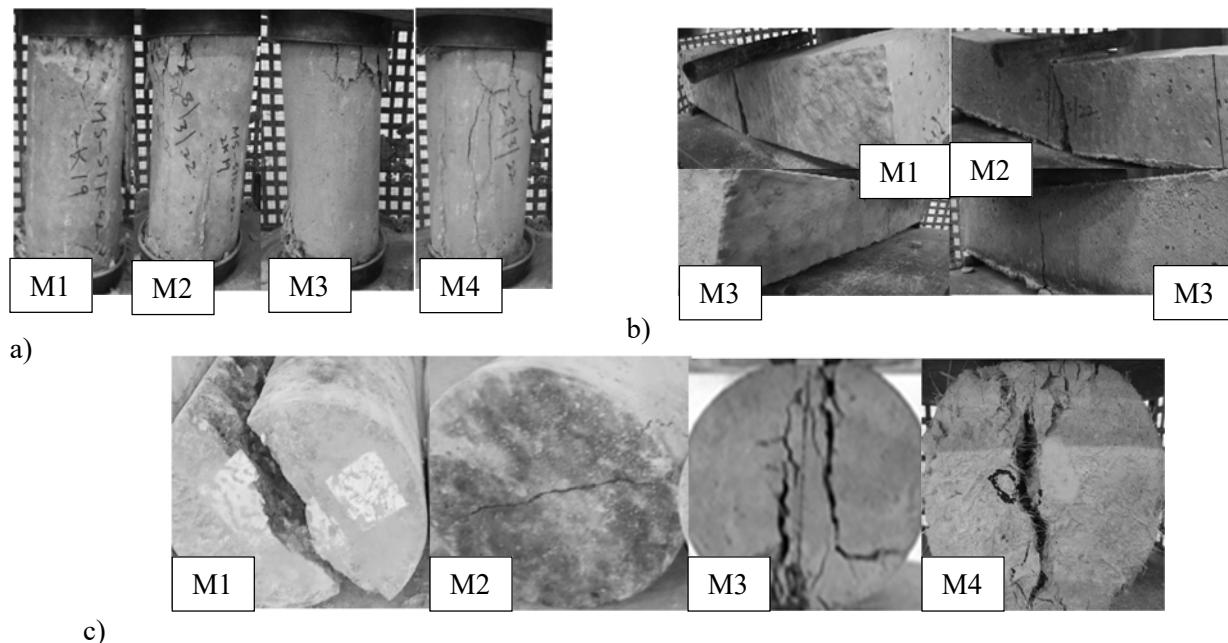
a) Failure modes in compression b) Failure modes in flexural c) Failure modes in tension
